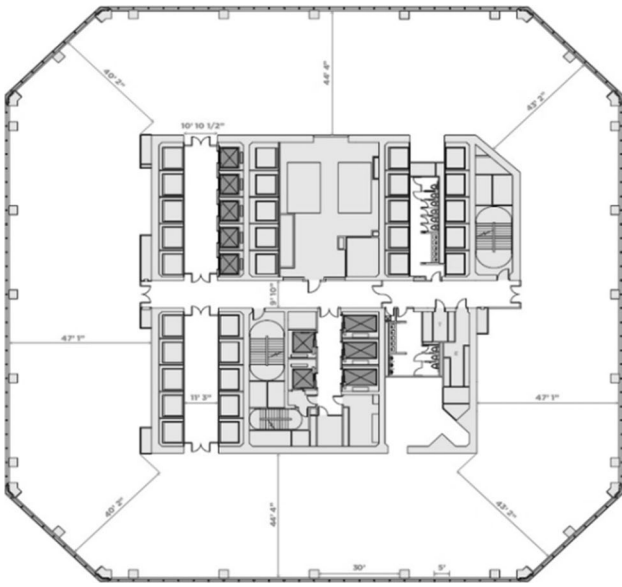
2D plan of a floor of the One World Tower Centre [29]
